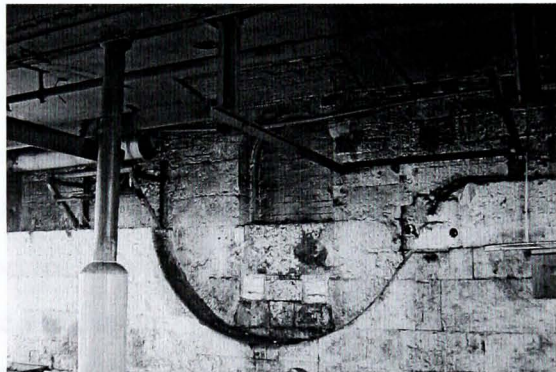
Recess for vertical gear transmitting power to principal lineshaft at Old Lane Mill, Northowram
